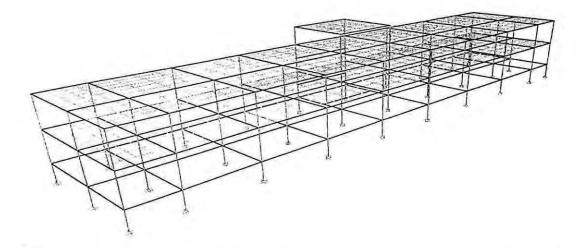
3D view of the FE model of a typical cyclone shelter funded by Germany (without bracing)
